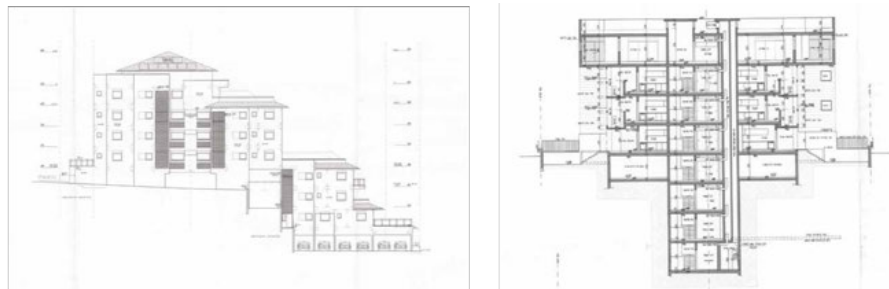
A façade of a building in the Hamaniyot Project; A section of a building in the Hamaniyot project (note the mushroom-like section), Shoham, 1997. (Shoham Construction Committee archives)
